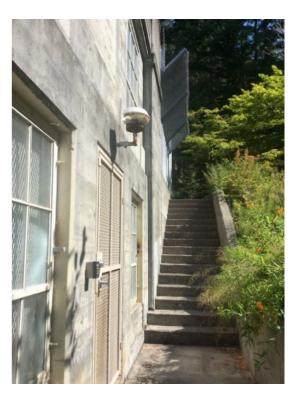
Gorge Powerhouse building exterior lighting – south walkway.
